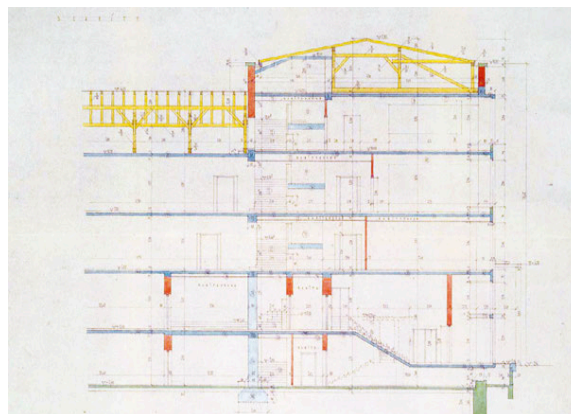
Original construction plan of hotting Secondary School, Innsbruck (Troi et al., 2015)
